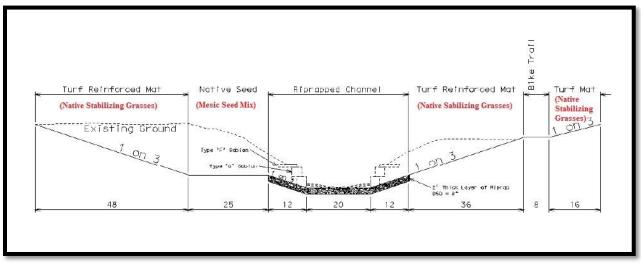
Typical cross-section of channel widening configuration from Cornhusker Avenue upstream to just east of 48th Street.
